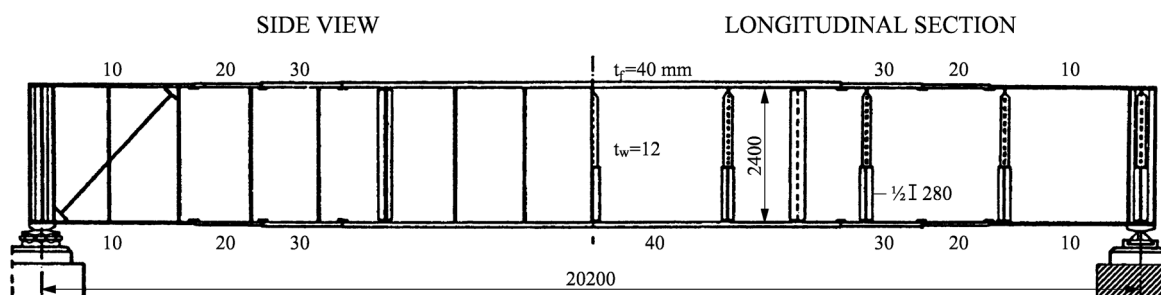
Plate girder for the four bridges constructed in the years 1937-1939
